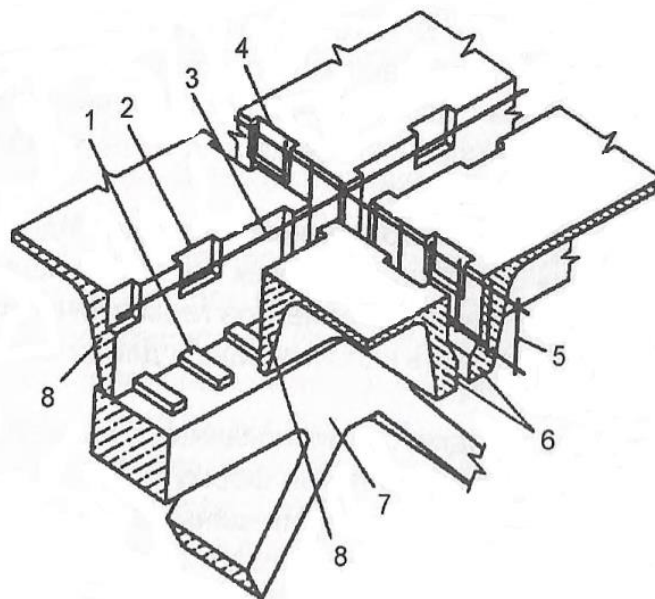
The joint of plates and diaphragm of a short cylindrical shell:
